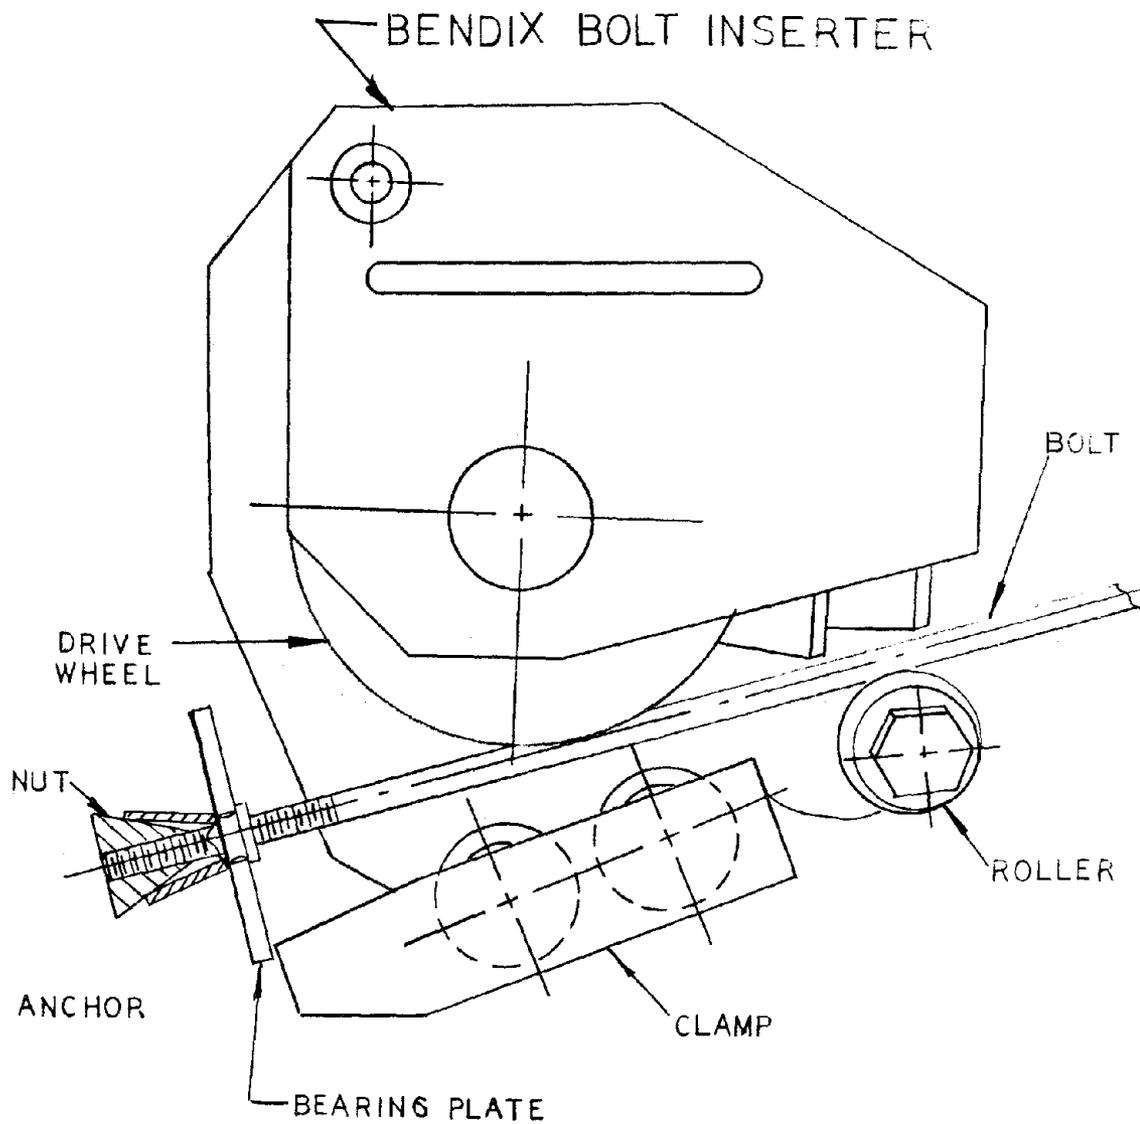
Bendix Bolt Inserter Loading Method No. 4
